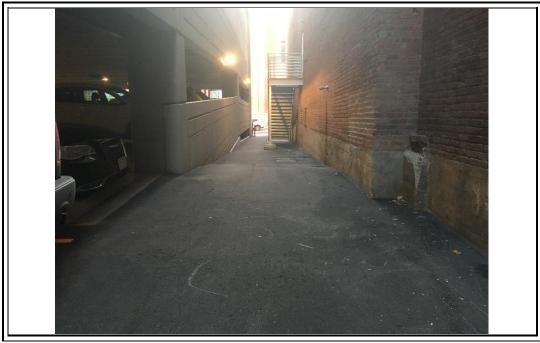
Looking southwest, toward Howard Street; paved surface cover in alley between 144 State Street (to the right) and the parking garage (to the left) (12/10/18).
